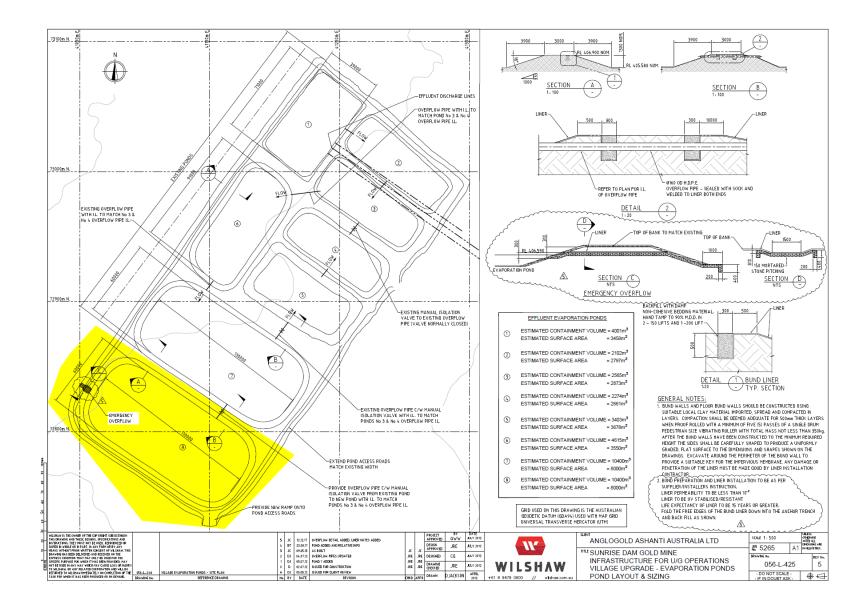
Proposed construction works for the sewage evaporation pond (highlighted yellow) (Wilshaw 2018)
